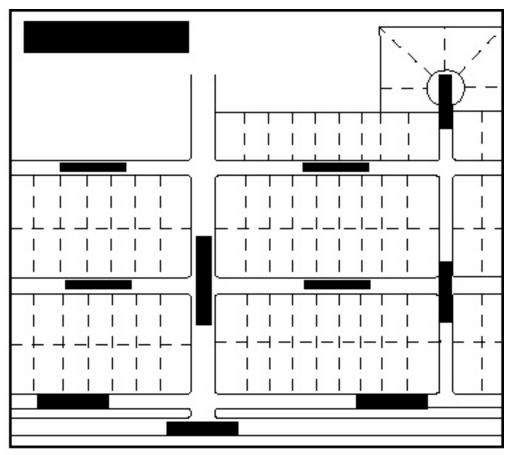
Configuration of streets shall provide access from local streets to collectors and from collectors to major streets and arterials.
